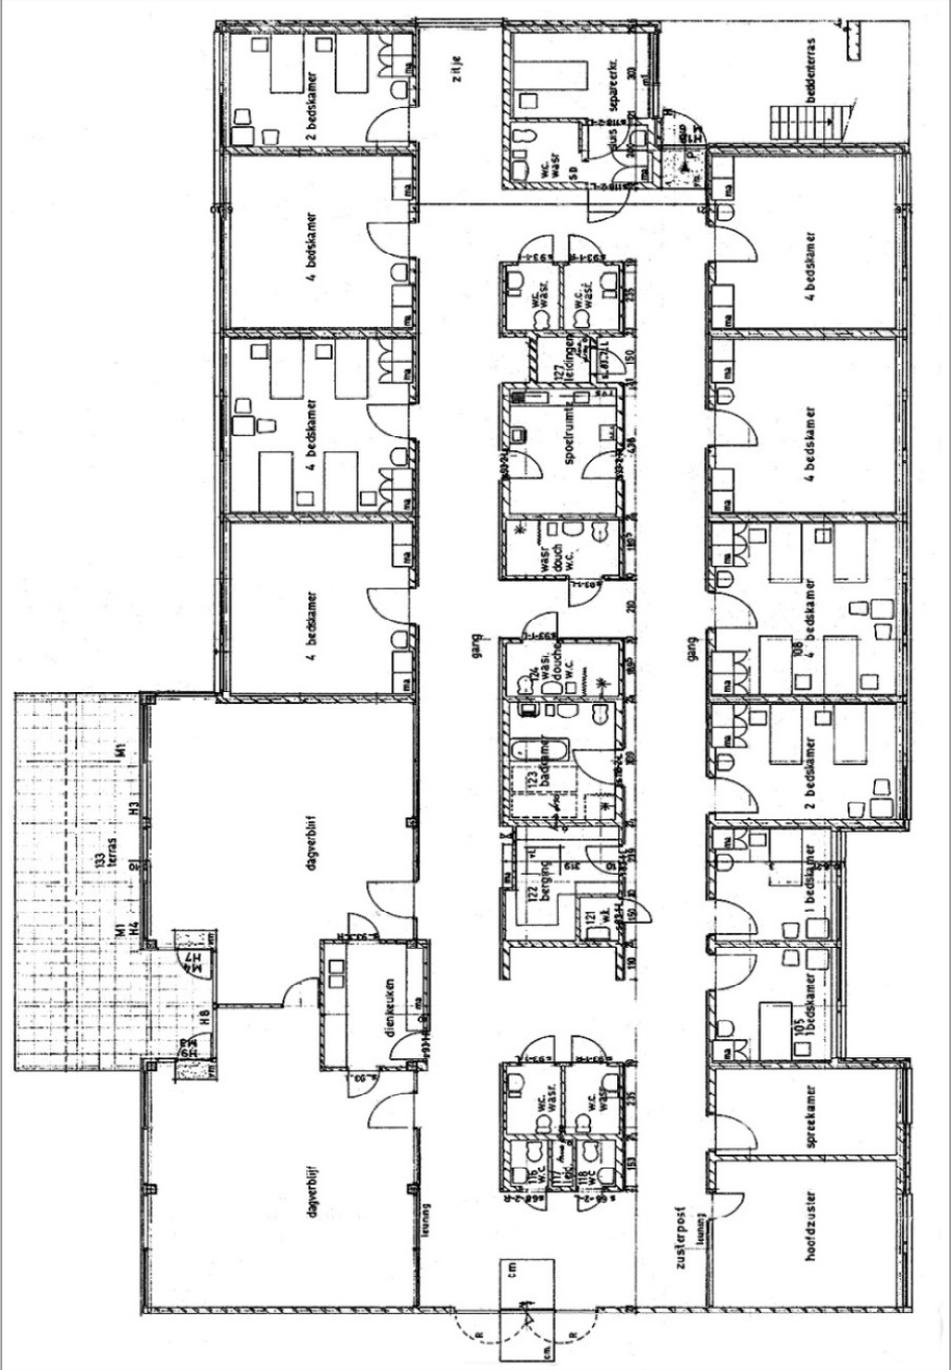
Modified outtake of wing C (Tilburg construction archives)
